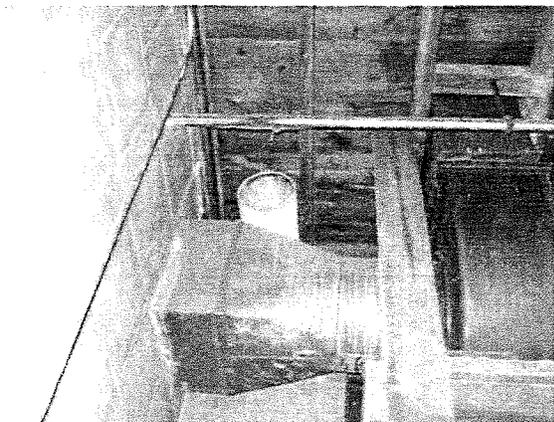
View of HA 14 - assumed cement pipe in warehouse
